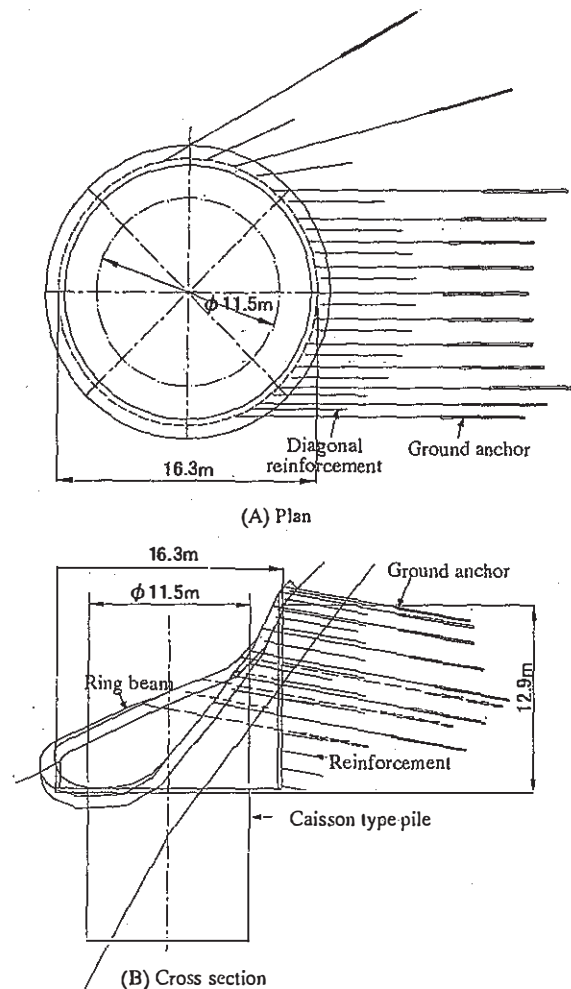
Plan and cross section of the angle exc. cylinder earth retaining.
